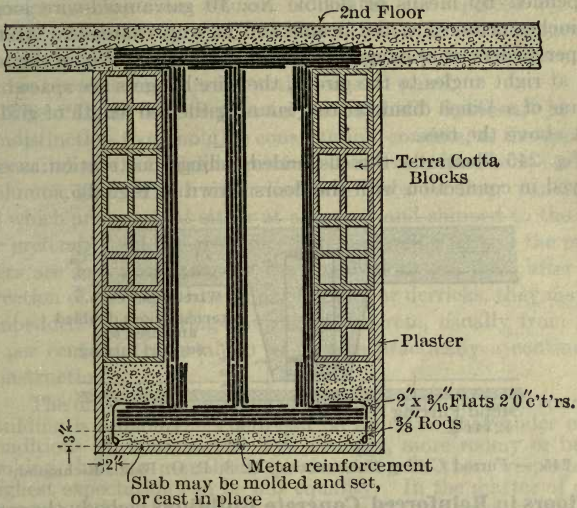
Box-girder Protection, Proposed Appraisers' Stores, Boston.
